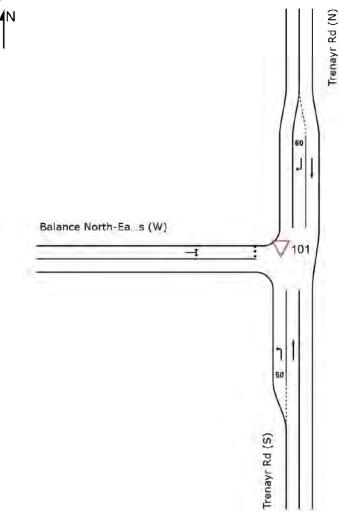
SIDRA Intersection Layout of Trenayr Road / North Site Access (Intersection 3)
